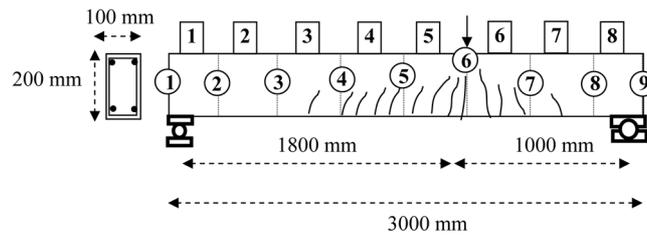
A Simply supported reinforced concrete beam used in damage identification experiment
